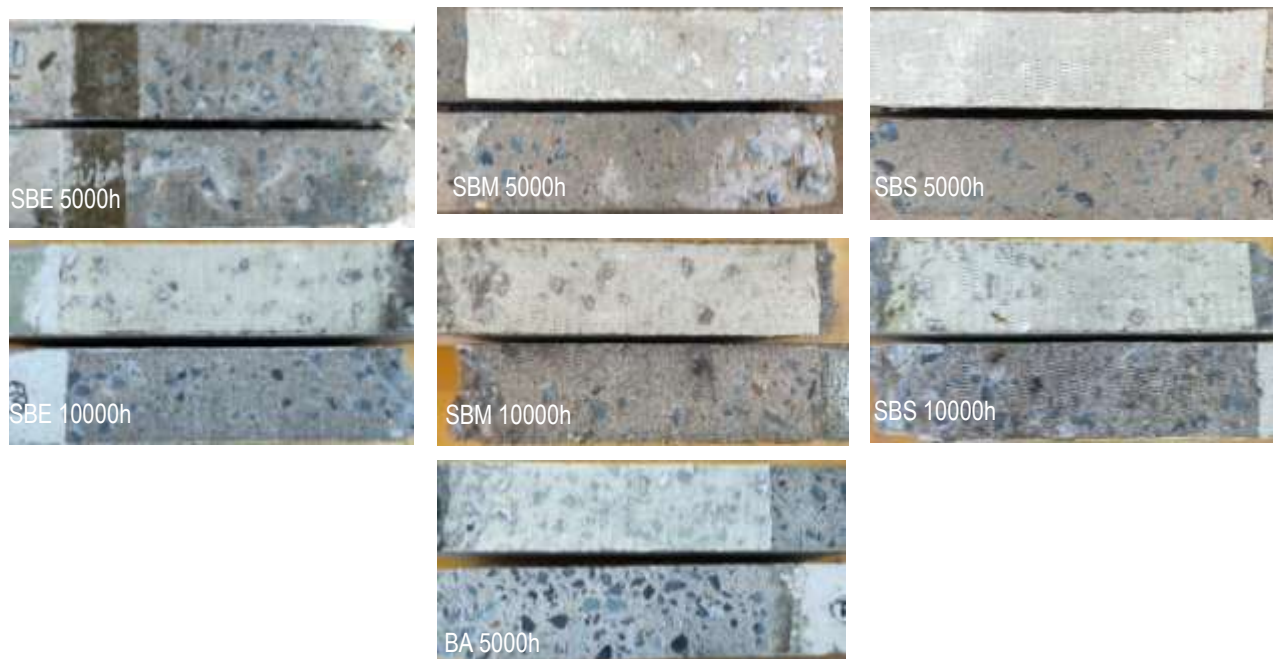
Fracture planes of concrete beam strengthened with glass fiber-reinforced polymer
